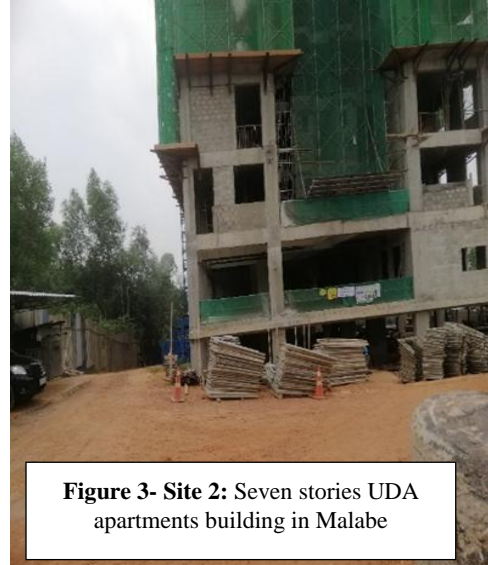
Site 2: Seven stories UDA apartments building in Malabe
